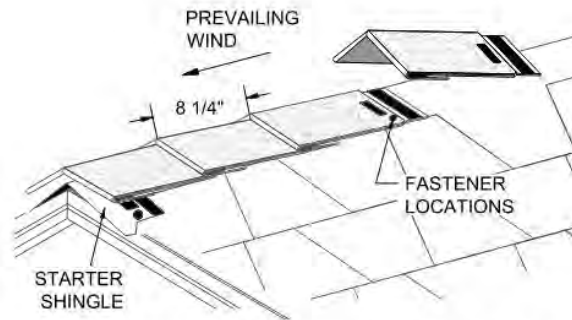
Placement and Fastening of EZ-Ridge™ Shingles, Maintaining the 8 1/4" Exposure
